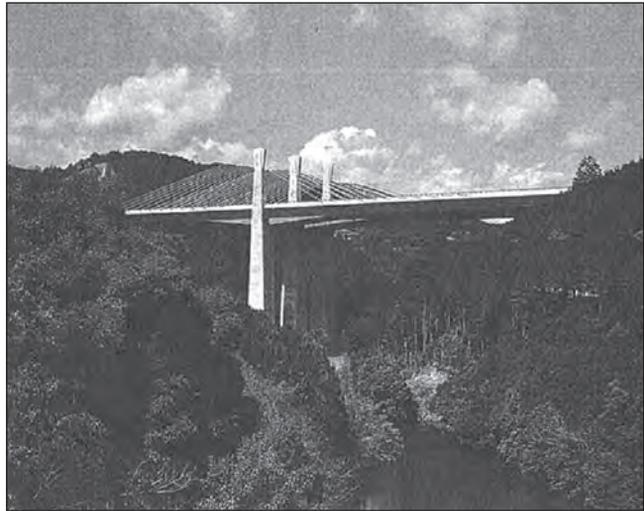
Tsukuhara Bridge*<sup>29</sup>
